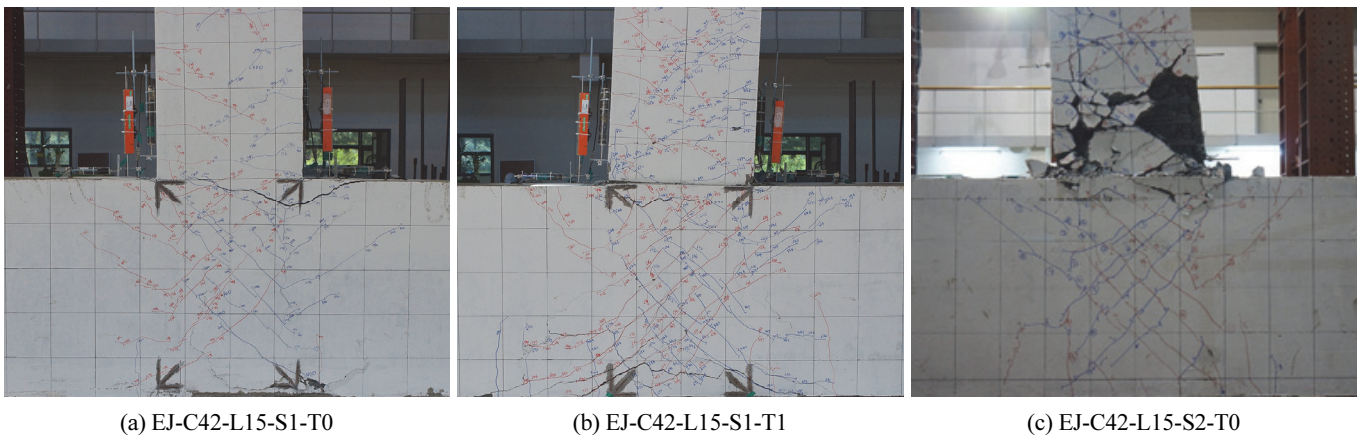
Crack and failure modes of the exterior beam-column joint
